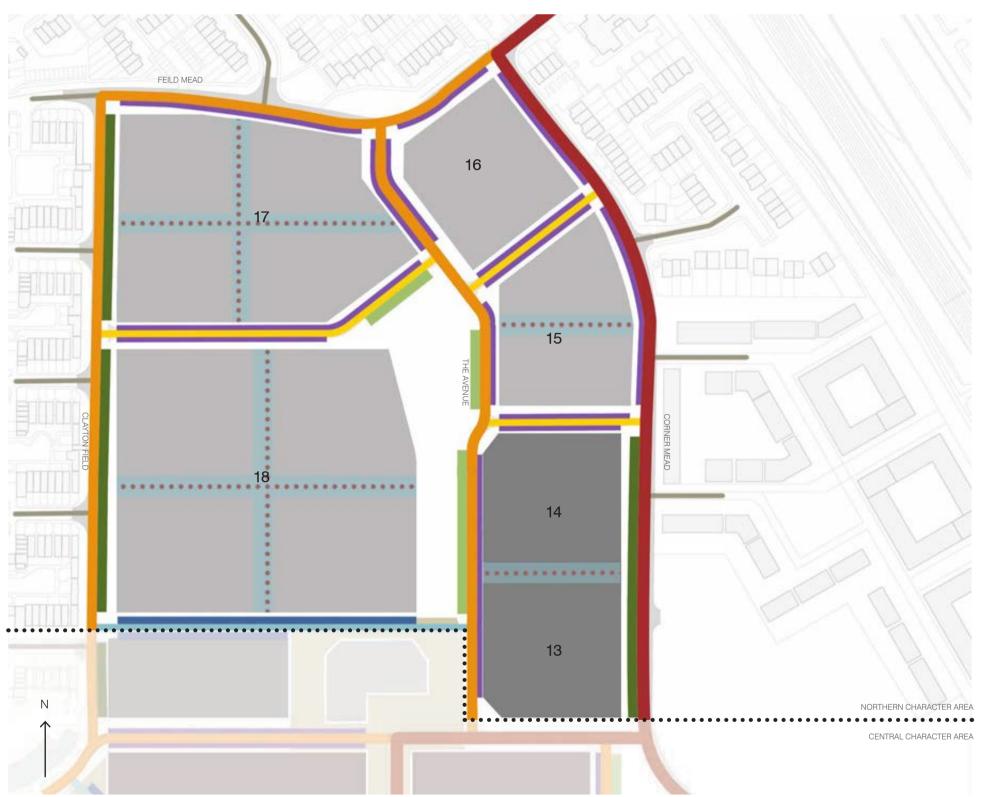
Combined Parameter Plan for Character Area Street and Parking Strategy
